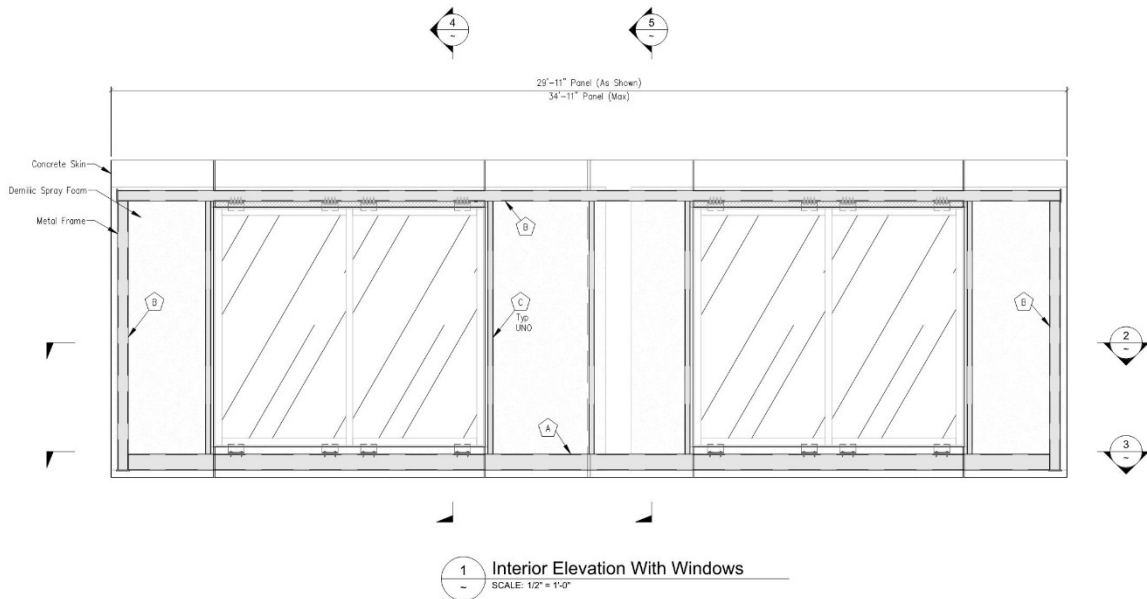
Infinite Facade wall panel with windows interior elevation (not to scale)
